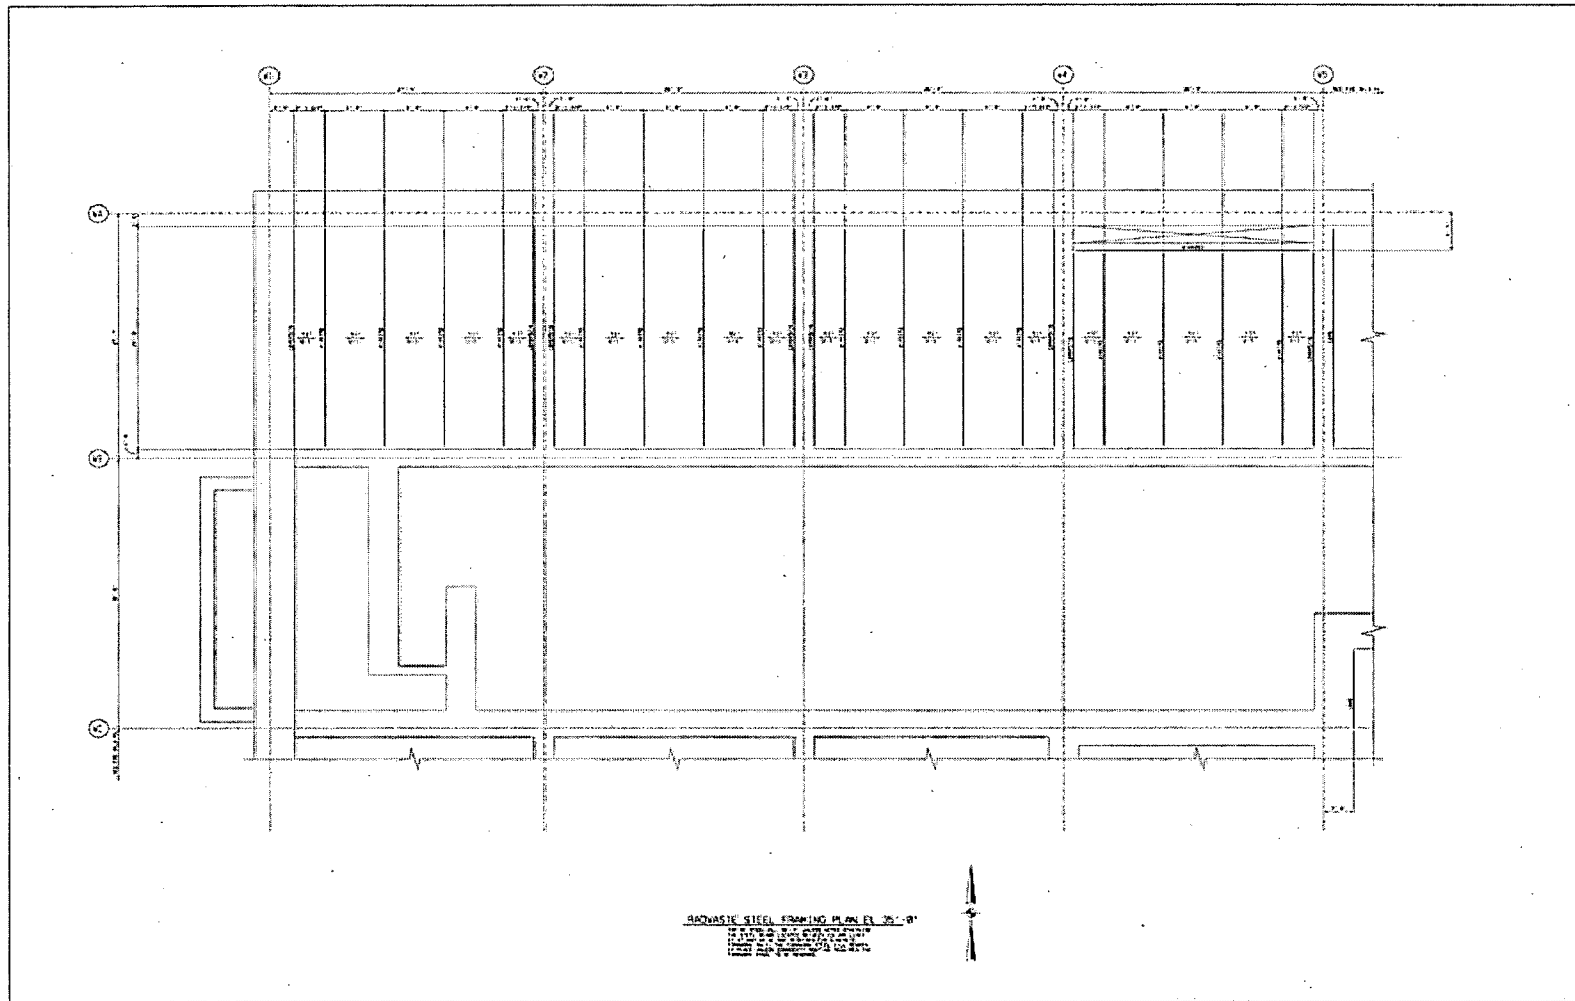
H.3-41: ELEVATION 95 LOOKING DOWN
